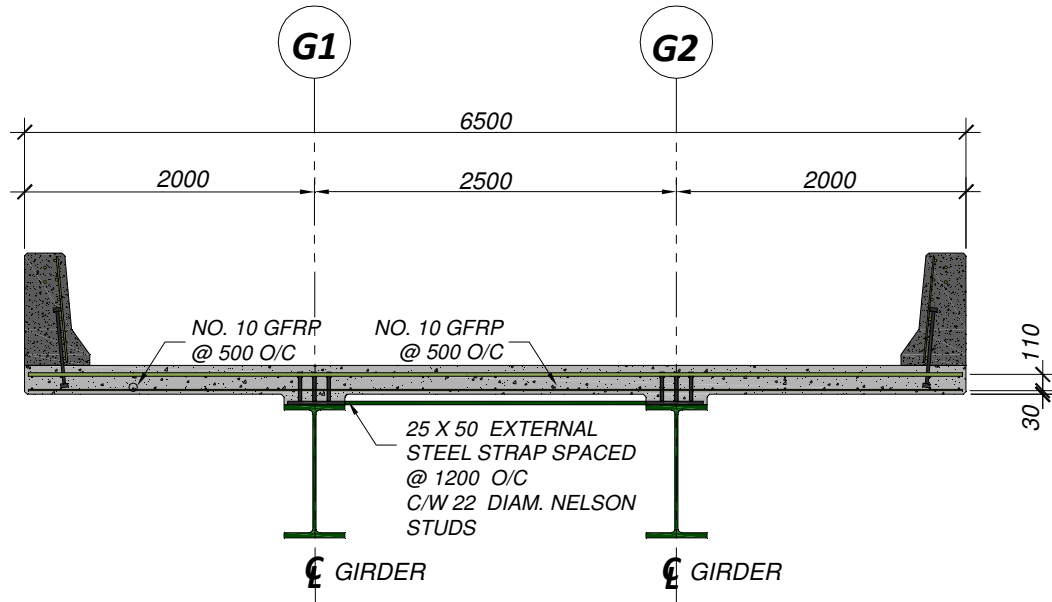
(b): Typical cross section illustrating the bottom reinforcement details for section with GFRP reinforcement (Cross section “D” from Figure 3-9(a))
